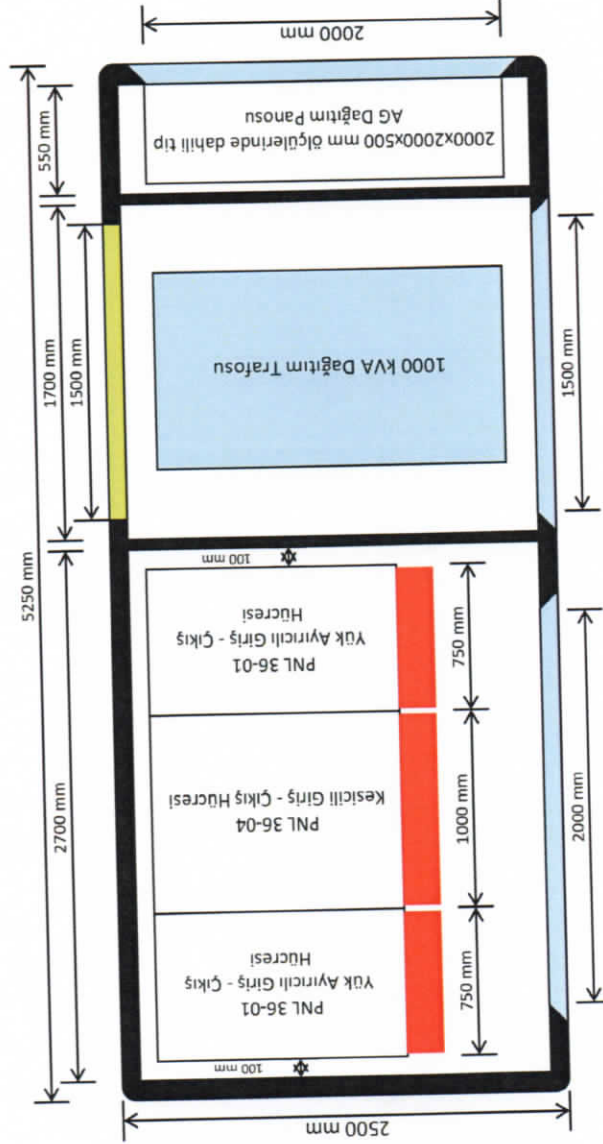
Aspect of 36/0.4 kV, 1000 kVA Monoblock Concrete Transformer Substation
